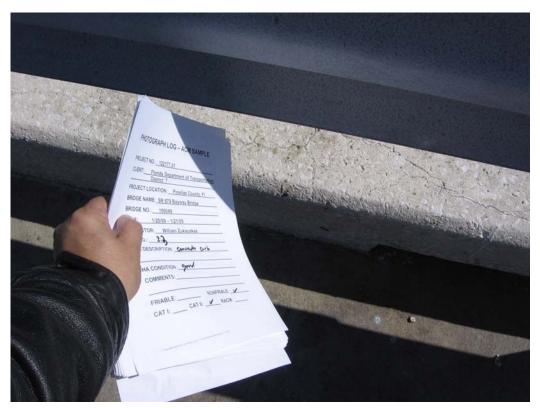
01/21/09 – SAMPLE 3.3 – HA 3 CONCRETE CURB
